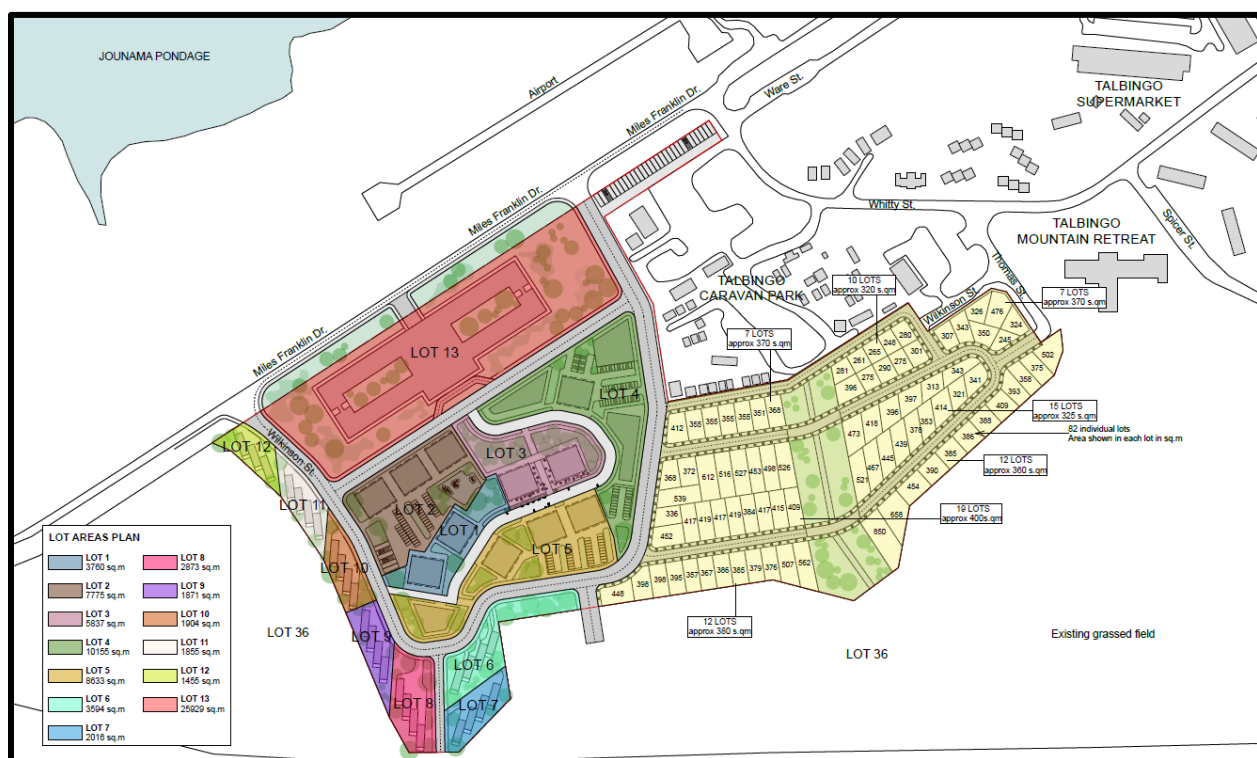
Indicative Subdivision Plan (Source: West Talbingo Village Masterplan – Robert Harwood Architects)
